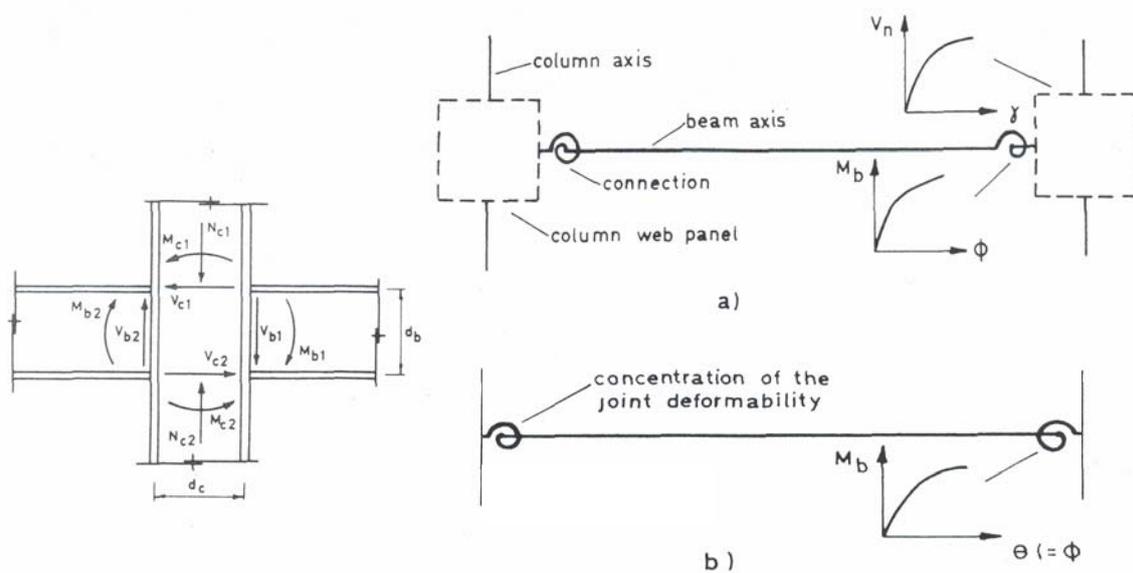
loading of a double-sided beam-to-column joint configuration & actual (a) and simplified (b) joint modelling
